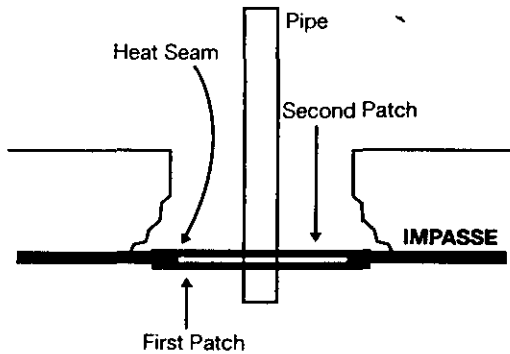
First patch of Impasse Barrier is placed underneath the exposed Impasse flaps. The second patch of Impasse Barrier is placed over the Impasse flap and heat seamed into place.
